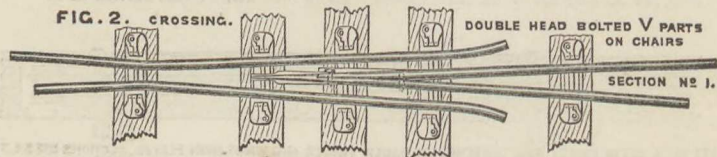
CROSSING. DOUBLE HEAD BOLTED V PARTS ON CHAIRS. SECTION N° 1.
